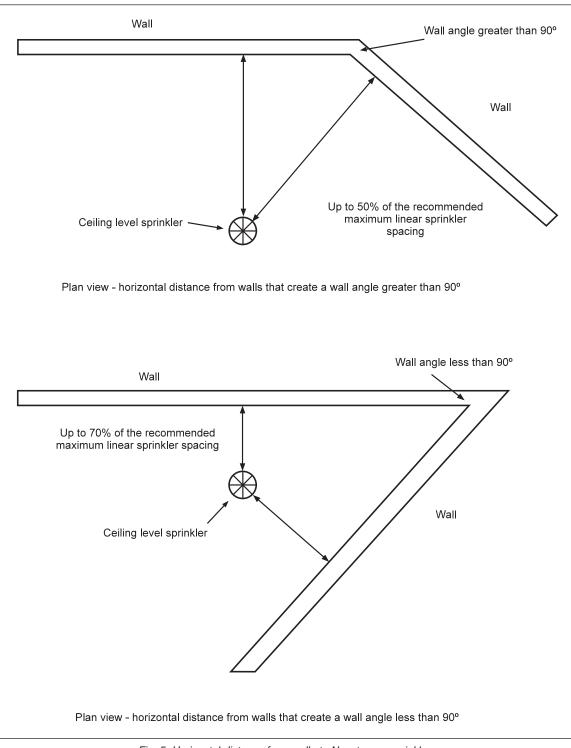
Horizontal distance from walls to Nonstorage sprinklers
